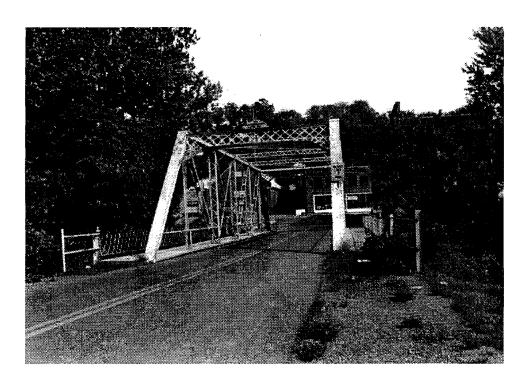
Two Lane Pratt Through Truss Built in 1885 (Town of Marion Structure No. 8003)
